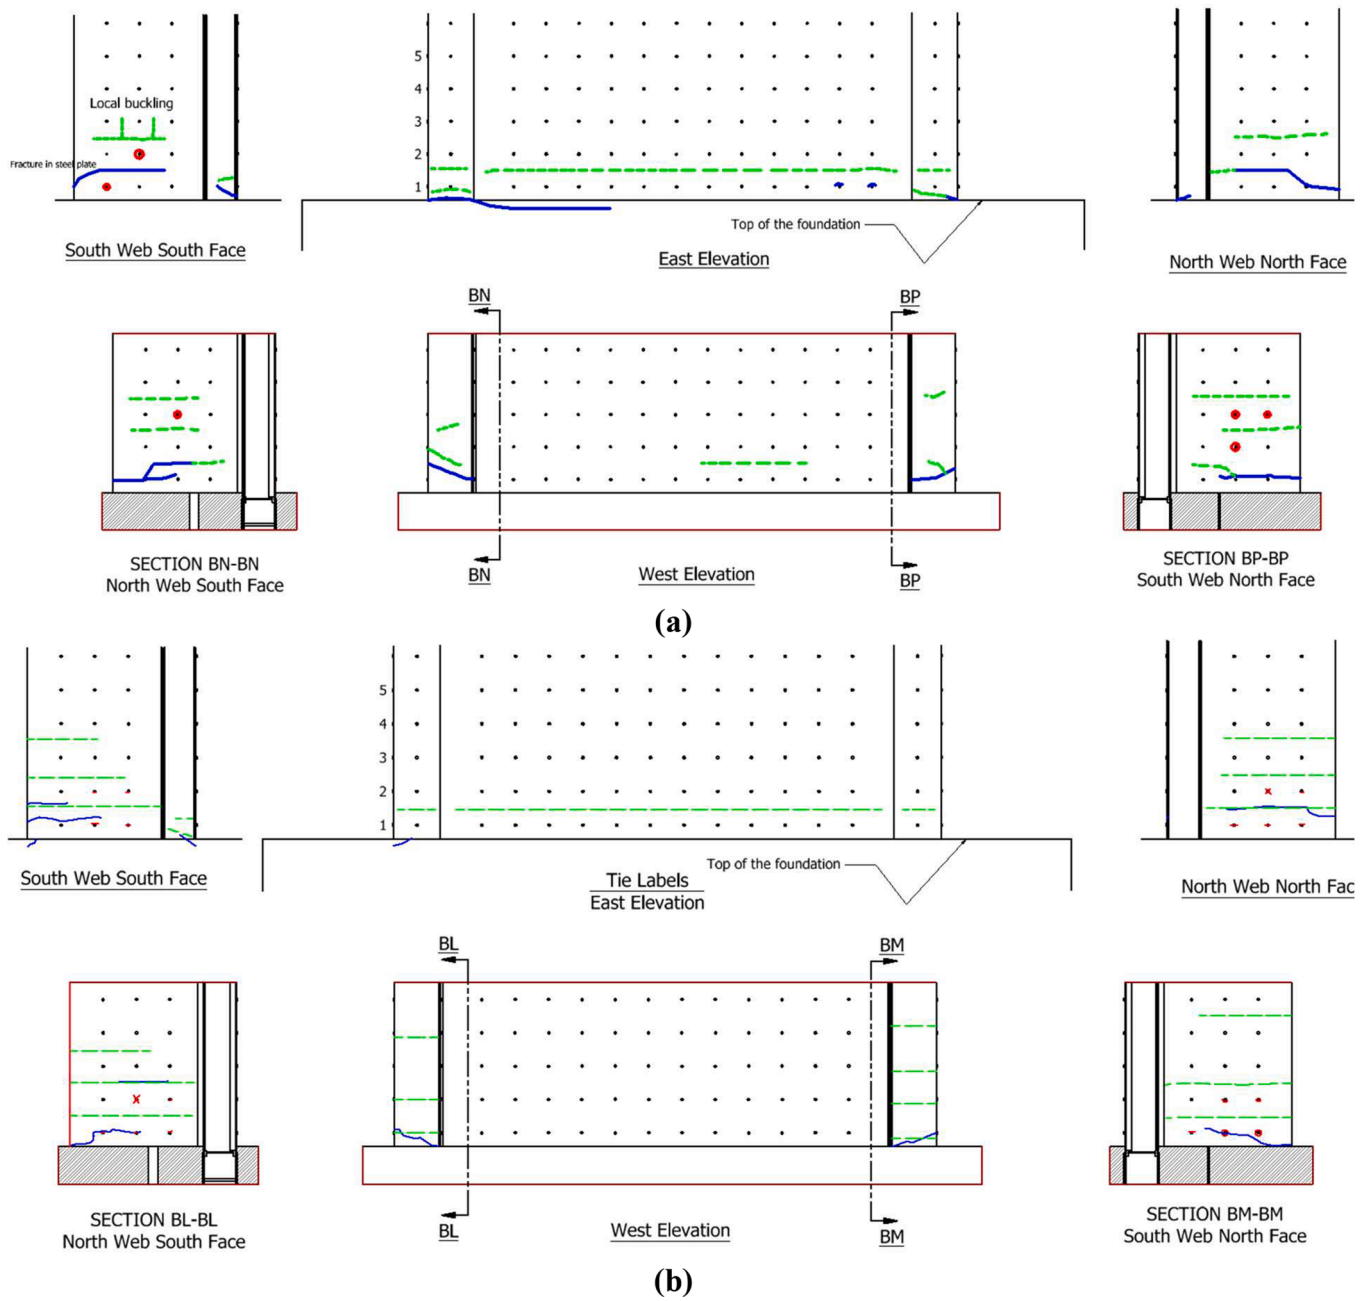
Post-test damage inspection of the wall steel plates for: (a) Specimen C1, and; (b) Specimen C.
